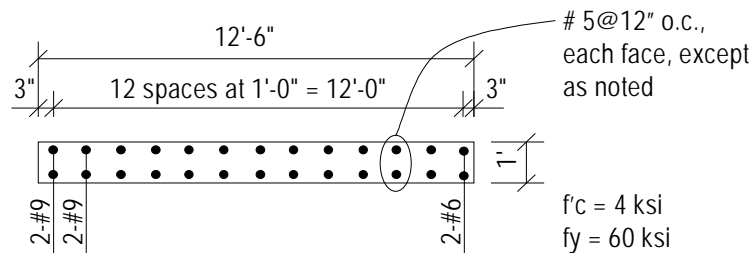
Example Two-Dimensional Wall Pier With Unsymmetrical Reinforcing
